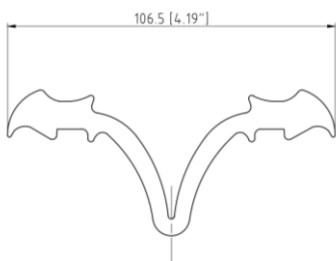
Cross-section of a typical “v-shaped” strip seal
